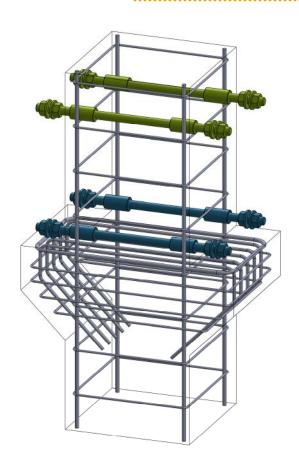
COPRA® Anchoring Couplers in a double-sided beam-to-column connection.
